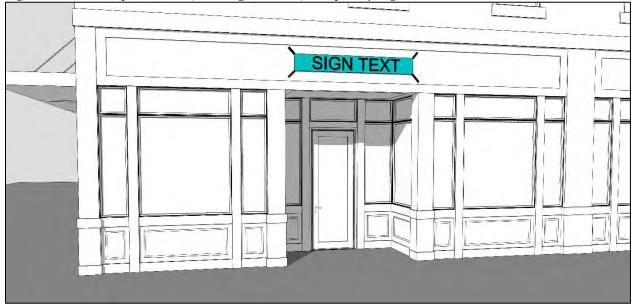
Example Banner (Building-Mounted) Temporary Sign
